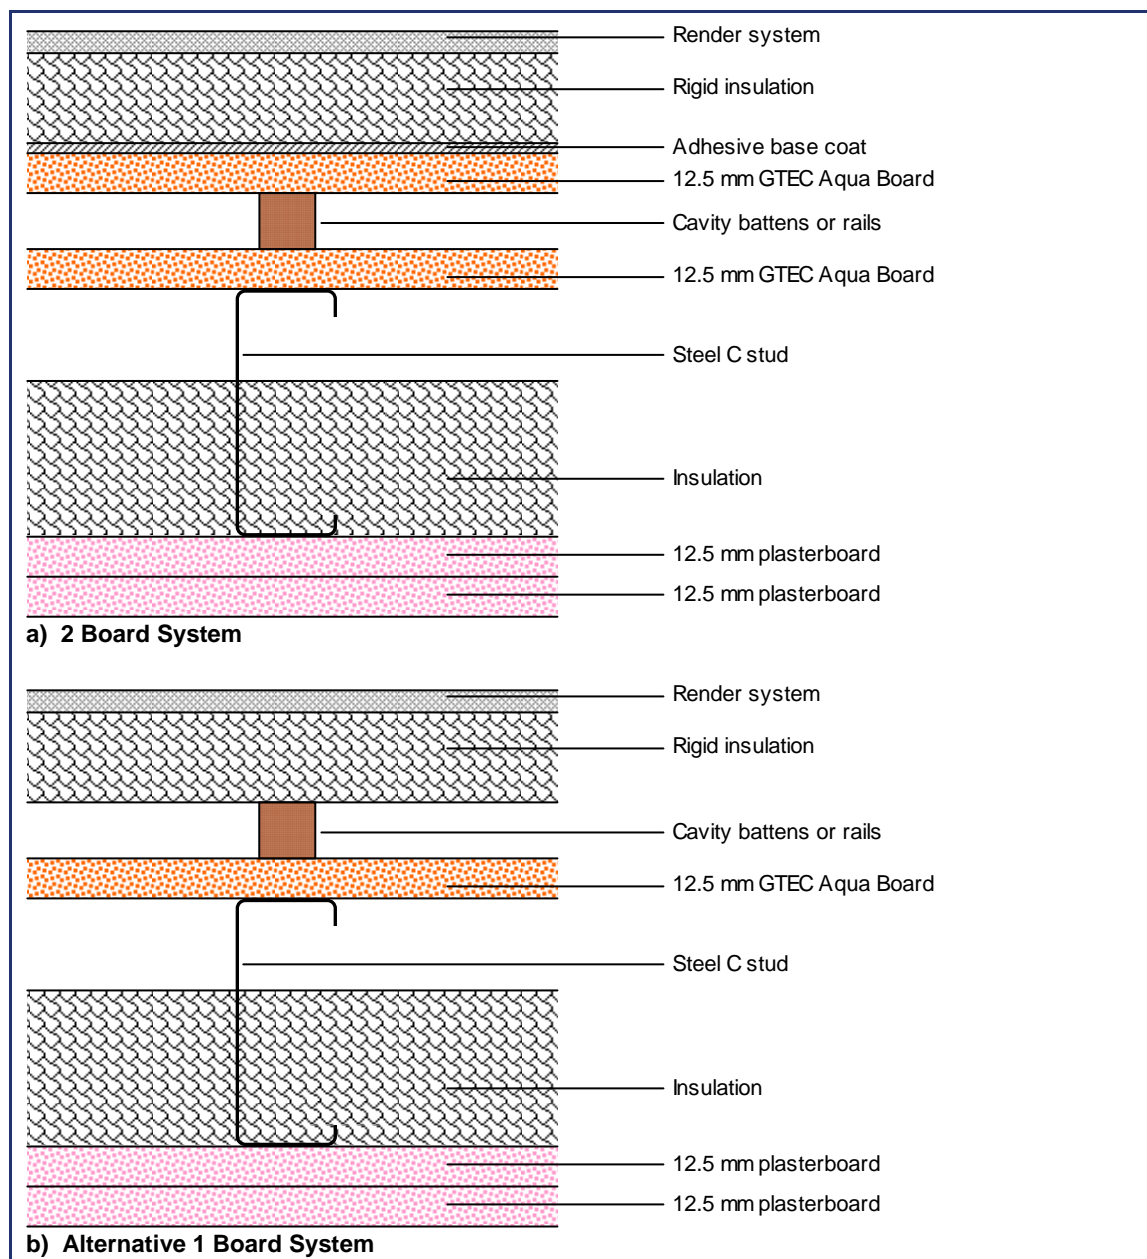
Aqua Board* used as external sheathing board with EIFS with cavity
